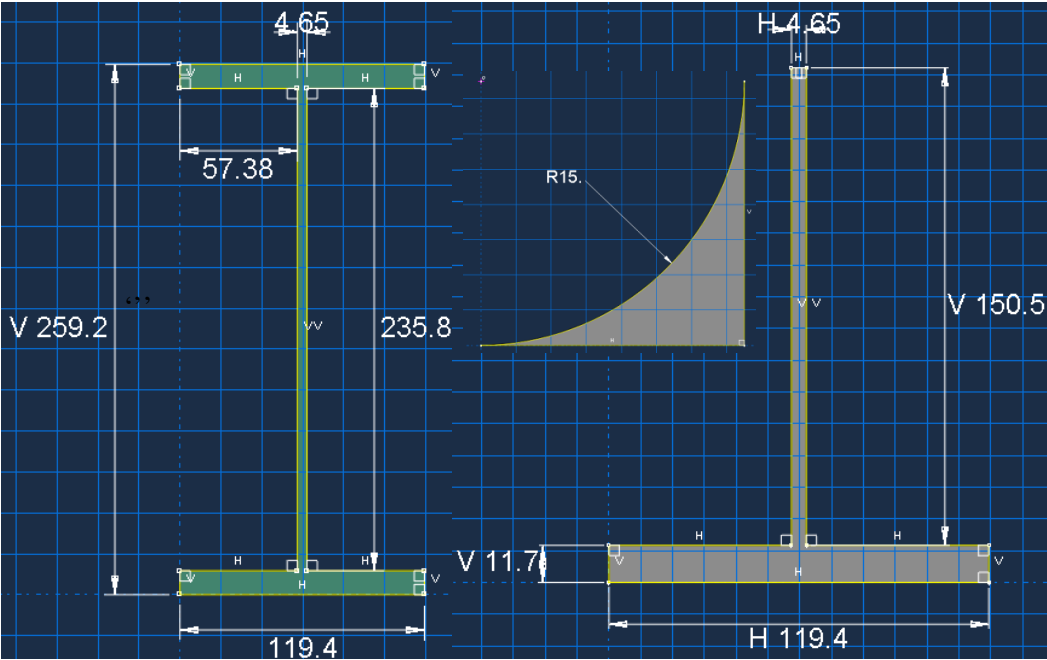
Dimensions of parts inputted into ABAQUS (A2 solid specimen)
